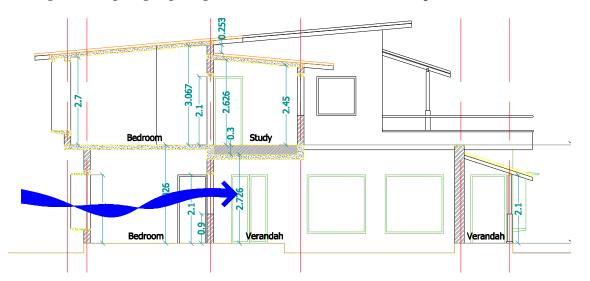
Cross sectional elevation depicting cross ventilation in one of the units
